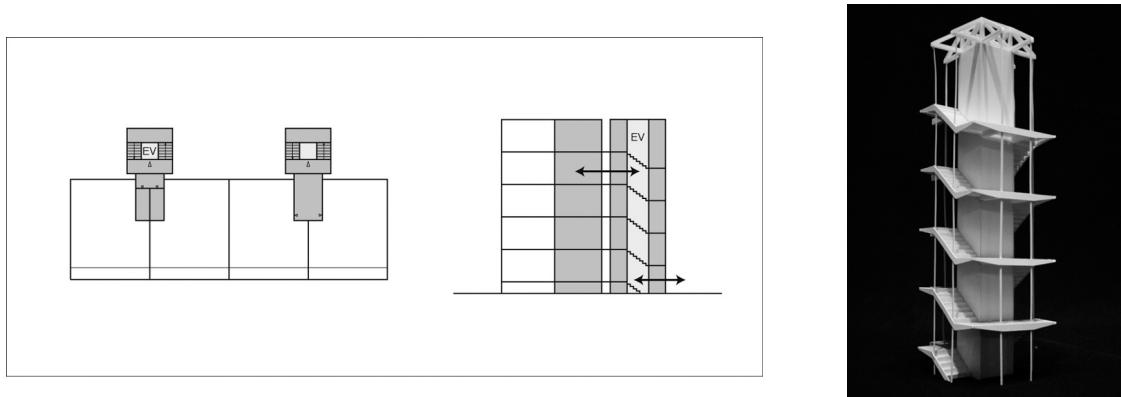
Section of building to which elevator tower is added for method 1 and plan view of method 4
